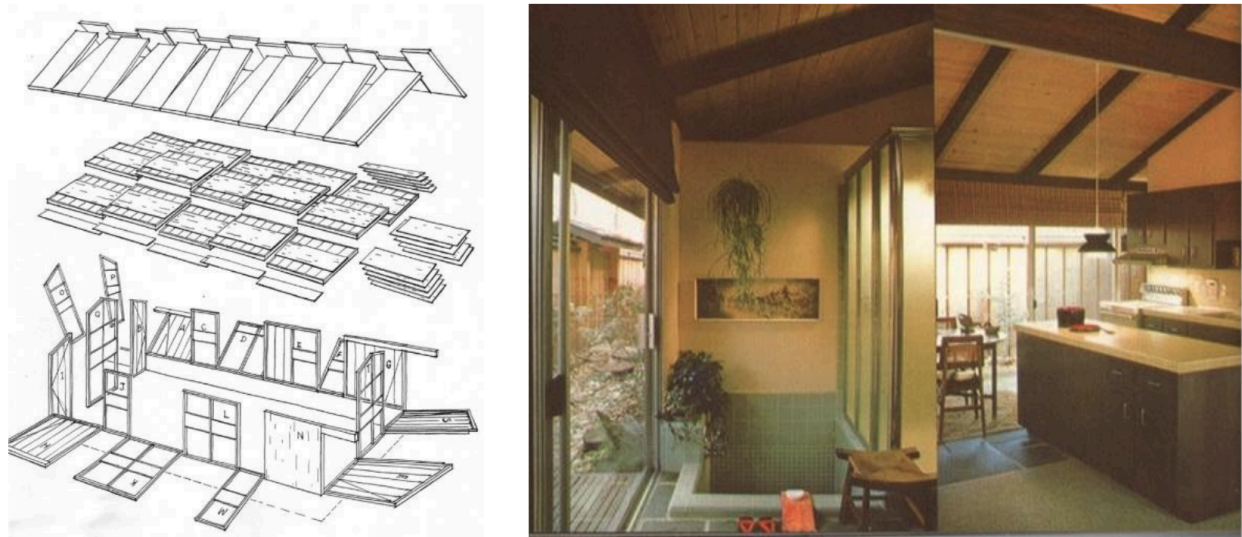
Techbuilt: Modern, Modular, Quick assembly and Made for the Masses
